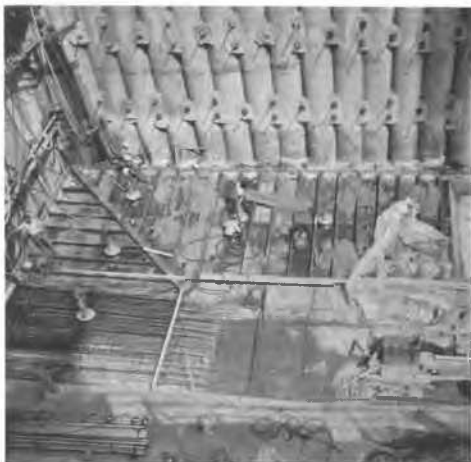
Shuttering for the construction of the cantilever arm, installation of the filling studs
